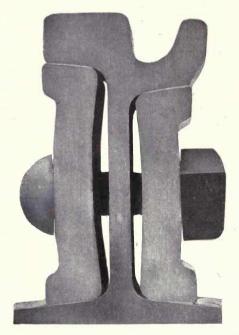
Showing bad Contact made by defective Bolt and Nut.
